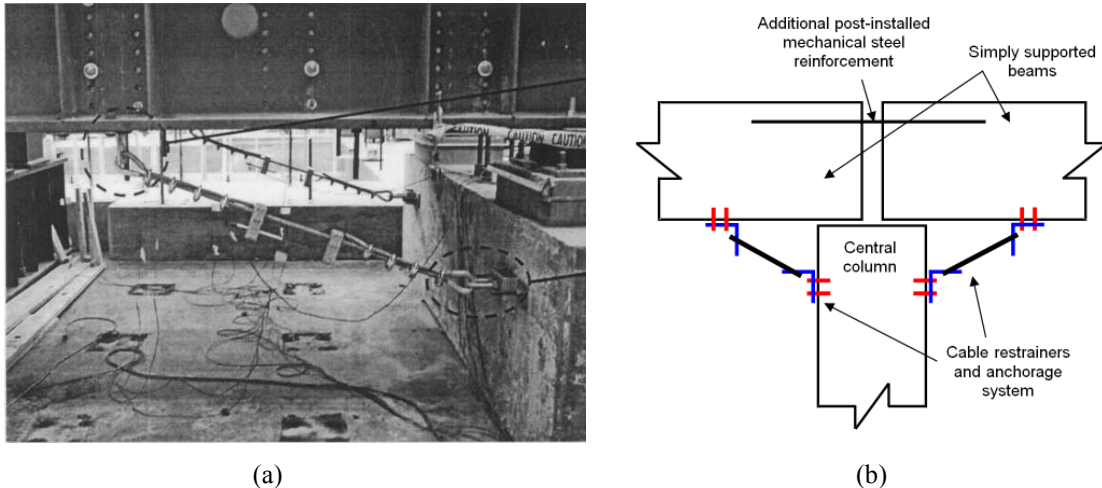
(a) Side view of a full-scale bridge model with seismic cable restrainers (DesRoches et al. 2003); (b) General concept of a retrofit solution for industrial buildings with beams simply supported on the column top comprising seismic cable restrainers and possibly additional steel reinforcement.
